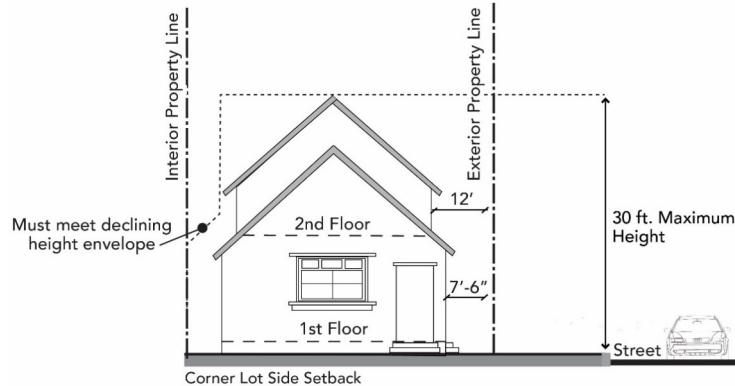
R-1 and R-1 Finish First Floor Exception for Declining Height Envelope
